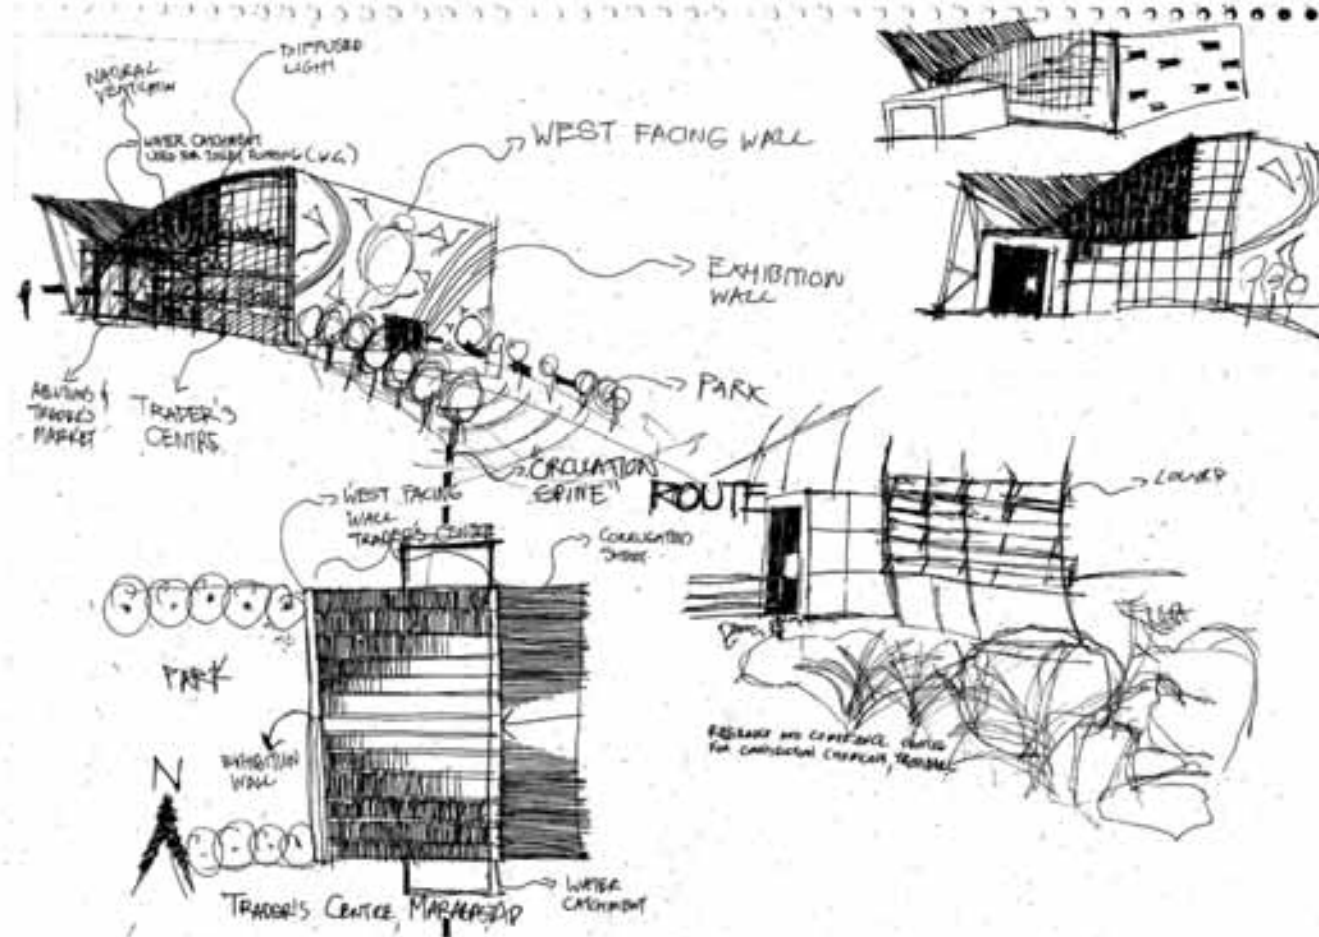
Collage of conceptual sketch plans 1 & 2 and interim submission (Author, 2009).
